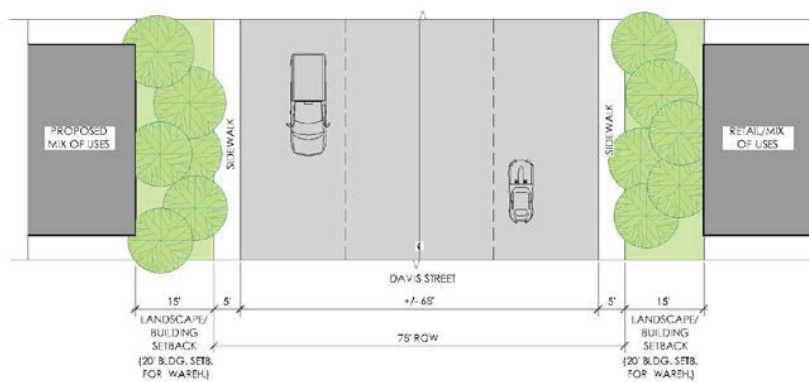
Hemlock Avenue and Davis Street Plan B
